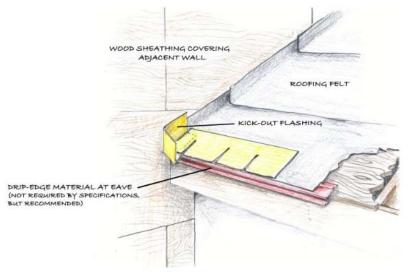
Step 1: Kick-out flashing beginning run of step flashing (Graphic courtesy of US EPA Indoor airPLUS)
